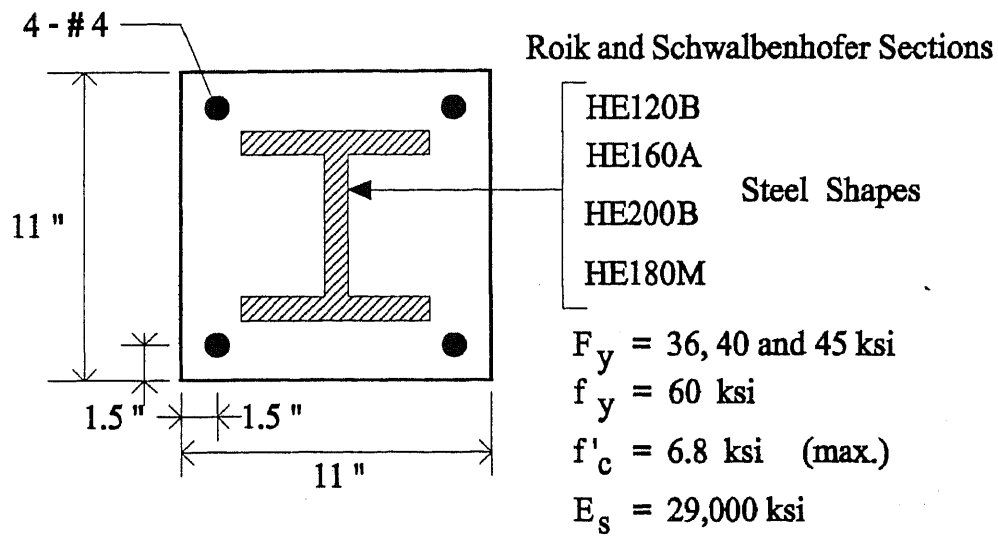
Roik and Schwalbenhofer composite column specimens
